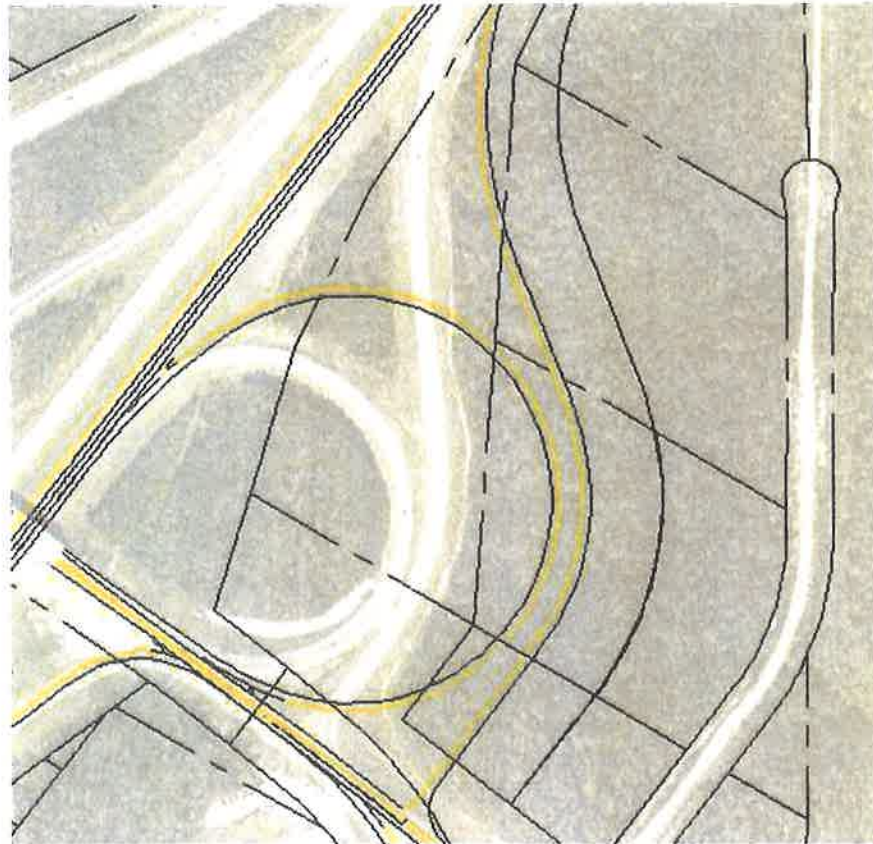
Concept Sketch of IC-5 (Realignment of EB Exit loop Ramp)
